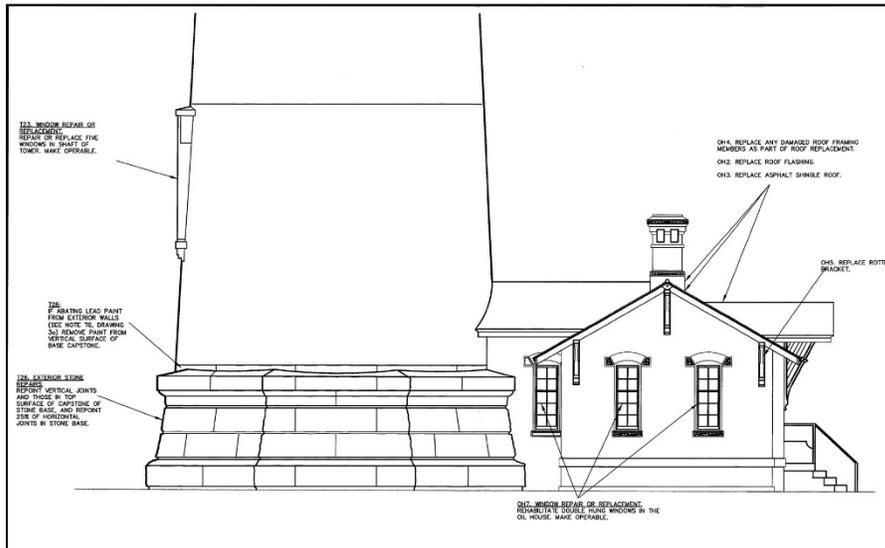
Oil house treatment plan, 2005. (Denver Service Center etic 603/25014)
